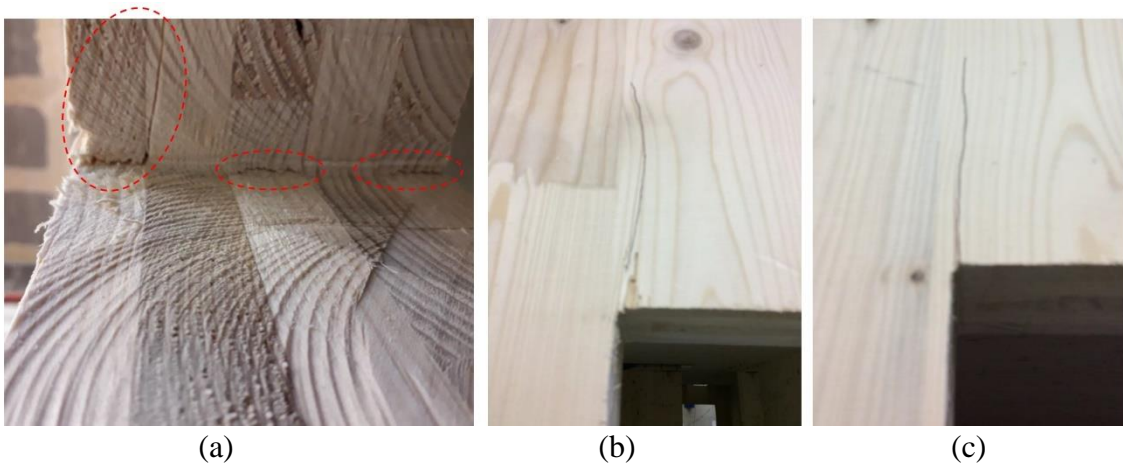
Cracks on top left corner of the openings 1500x2000 (a and b) and 900x2000 (c) on the ground floor wall in the facade B-B' during the monotonic transverse test
